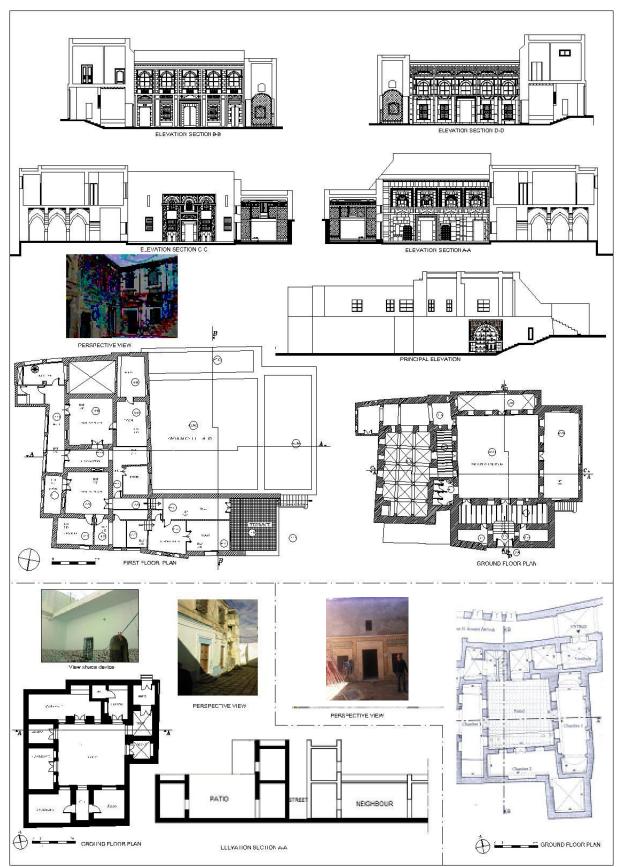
Architectural details of the selected houses in site 1: house A; house B; house C (from upper to lower and left to right respectively).
